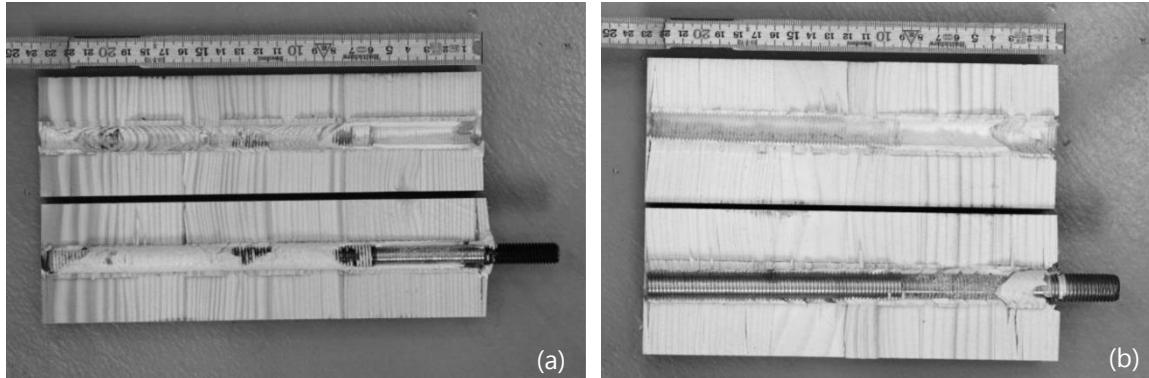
Adhesion failure at the interface (a) adhesive – wood and (b) adhesive – steel (Steiger, 2012)
